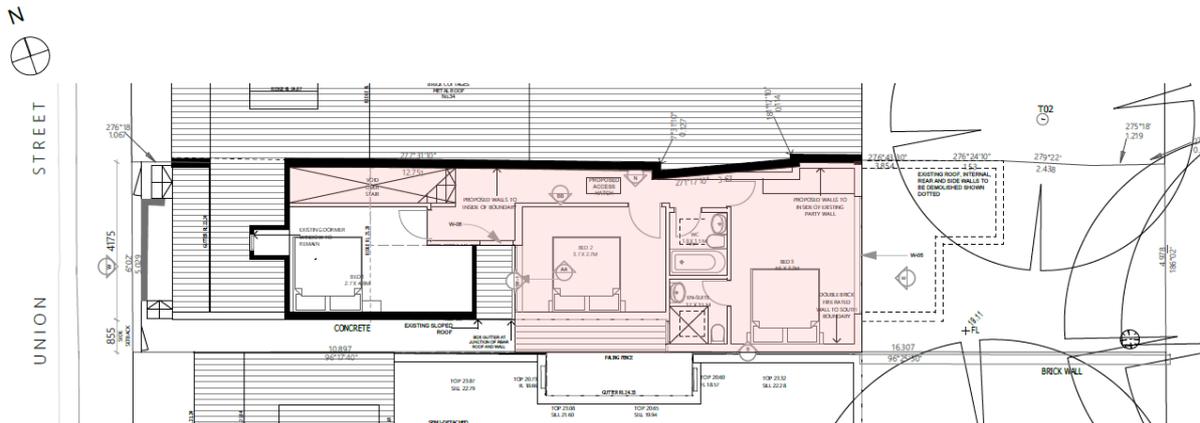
Proposed First Floor Level (extent of new works outlined in red)
